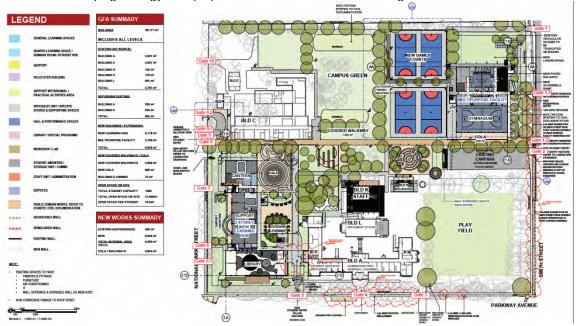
Site Plan – Ground Floor (10/2023) Source: EJE Architecture – Drawing No. A-0010
